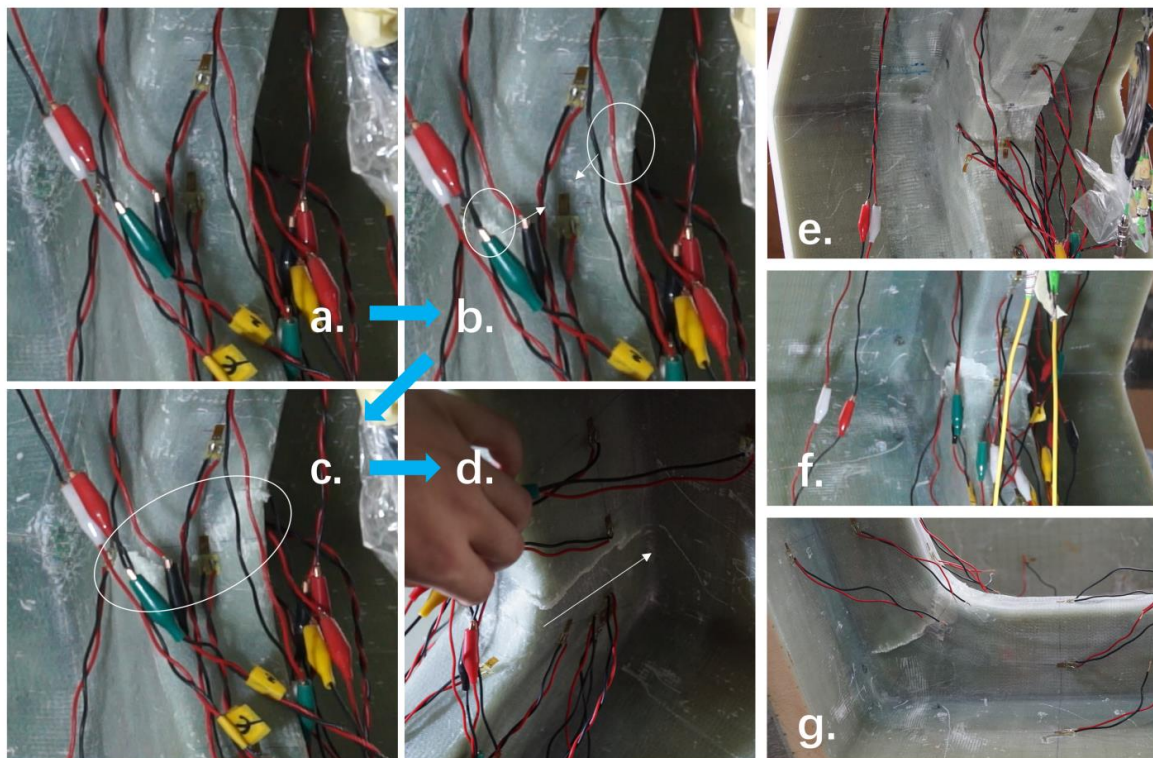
Failure phenomena of CR90 specimens. (a) CR90-3 before test; (b) damage appears on CR90-3; (c) damage expand across upper surface of CR90-3 in the shape of “S”; (d) crack runs down the sidewall on CR90-3; (e) crack of CR90-1 in a straight line; (f) crack of CR90-2 in the shape of “S”; (g) side crack of CR90-2 after test.
